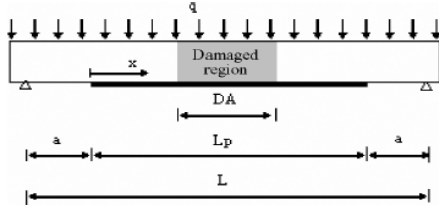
Simply supported damaged RC beam strengthened with bonded GFRP plate
